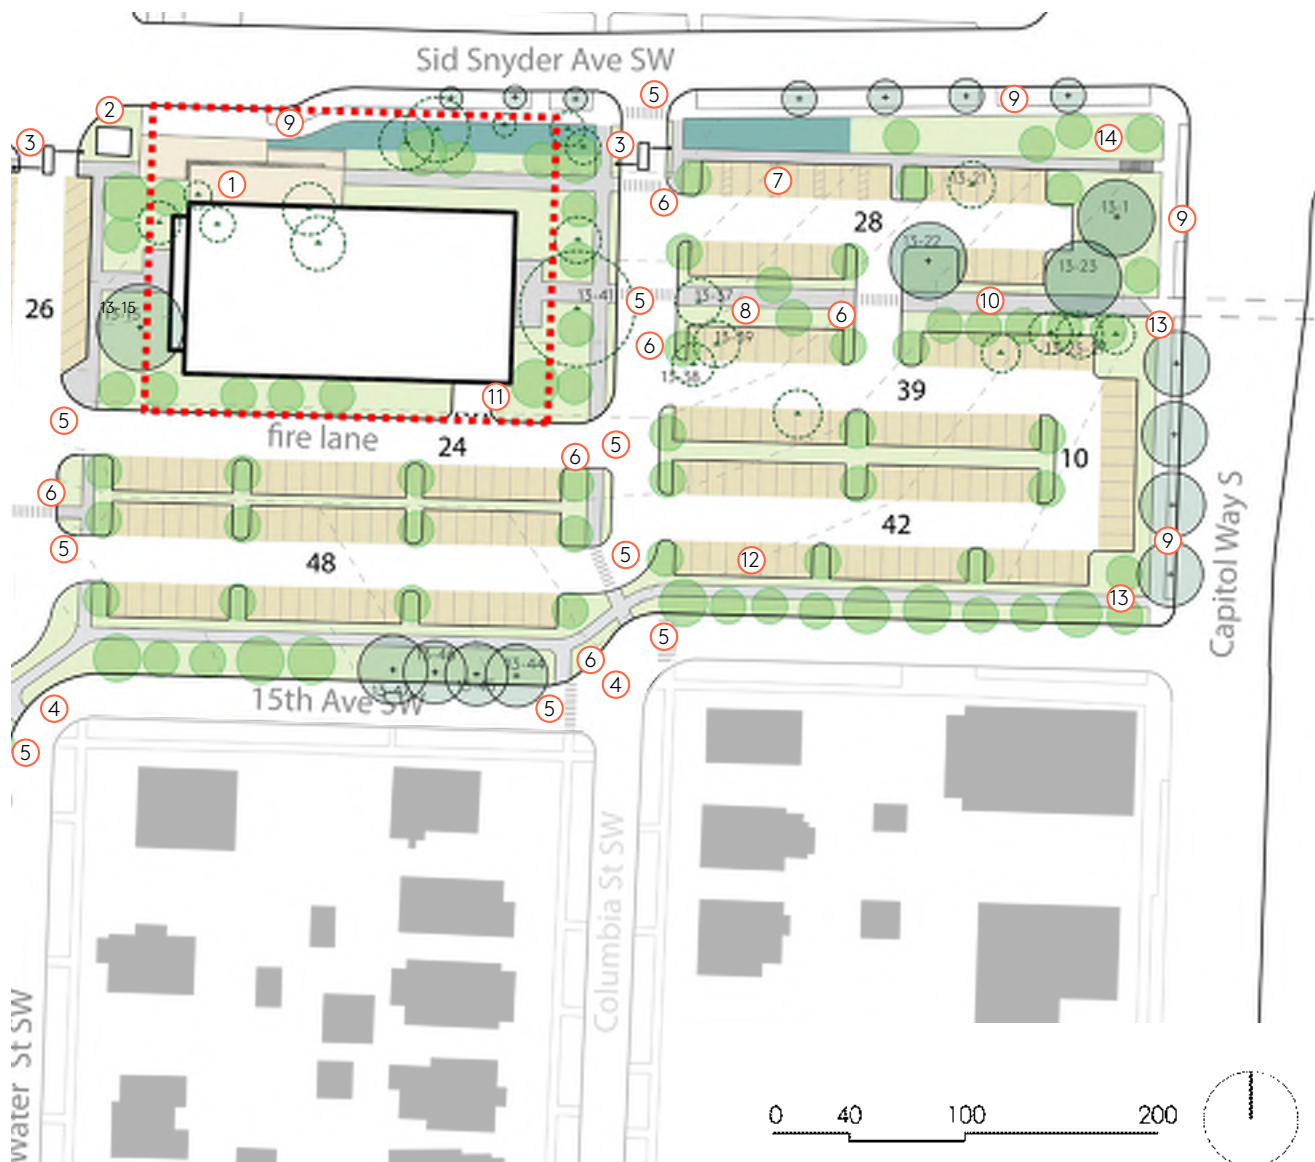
NEWHOUSE BUILDING SITE SECTION
